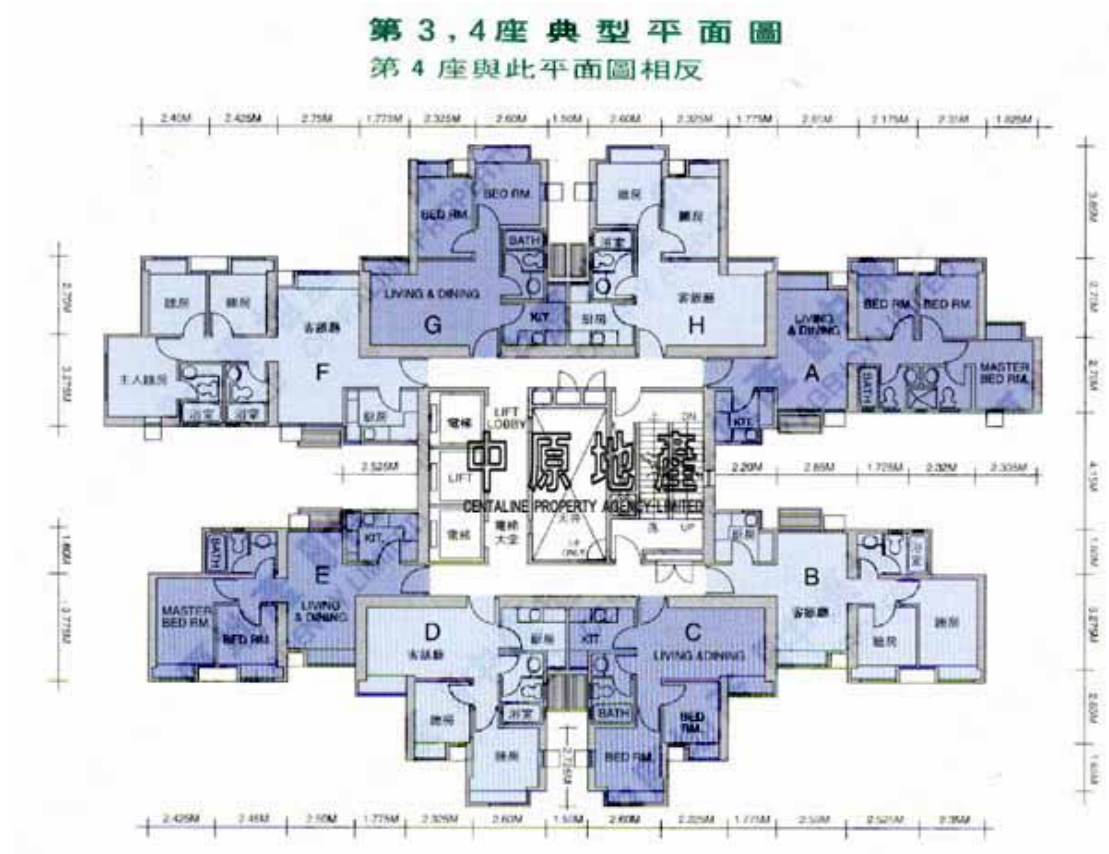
Building Plan of Block 3 and 4 of Bayshore Towers
